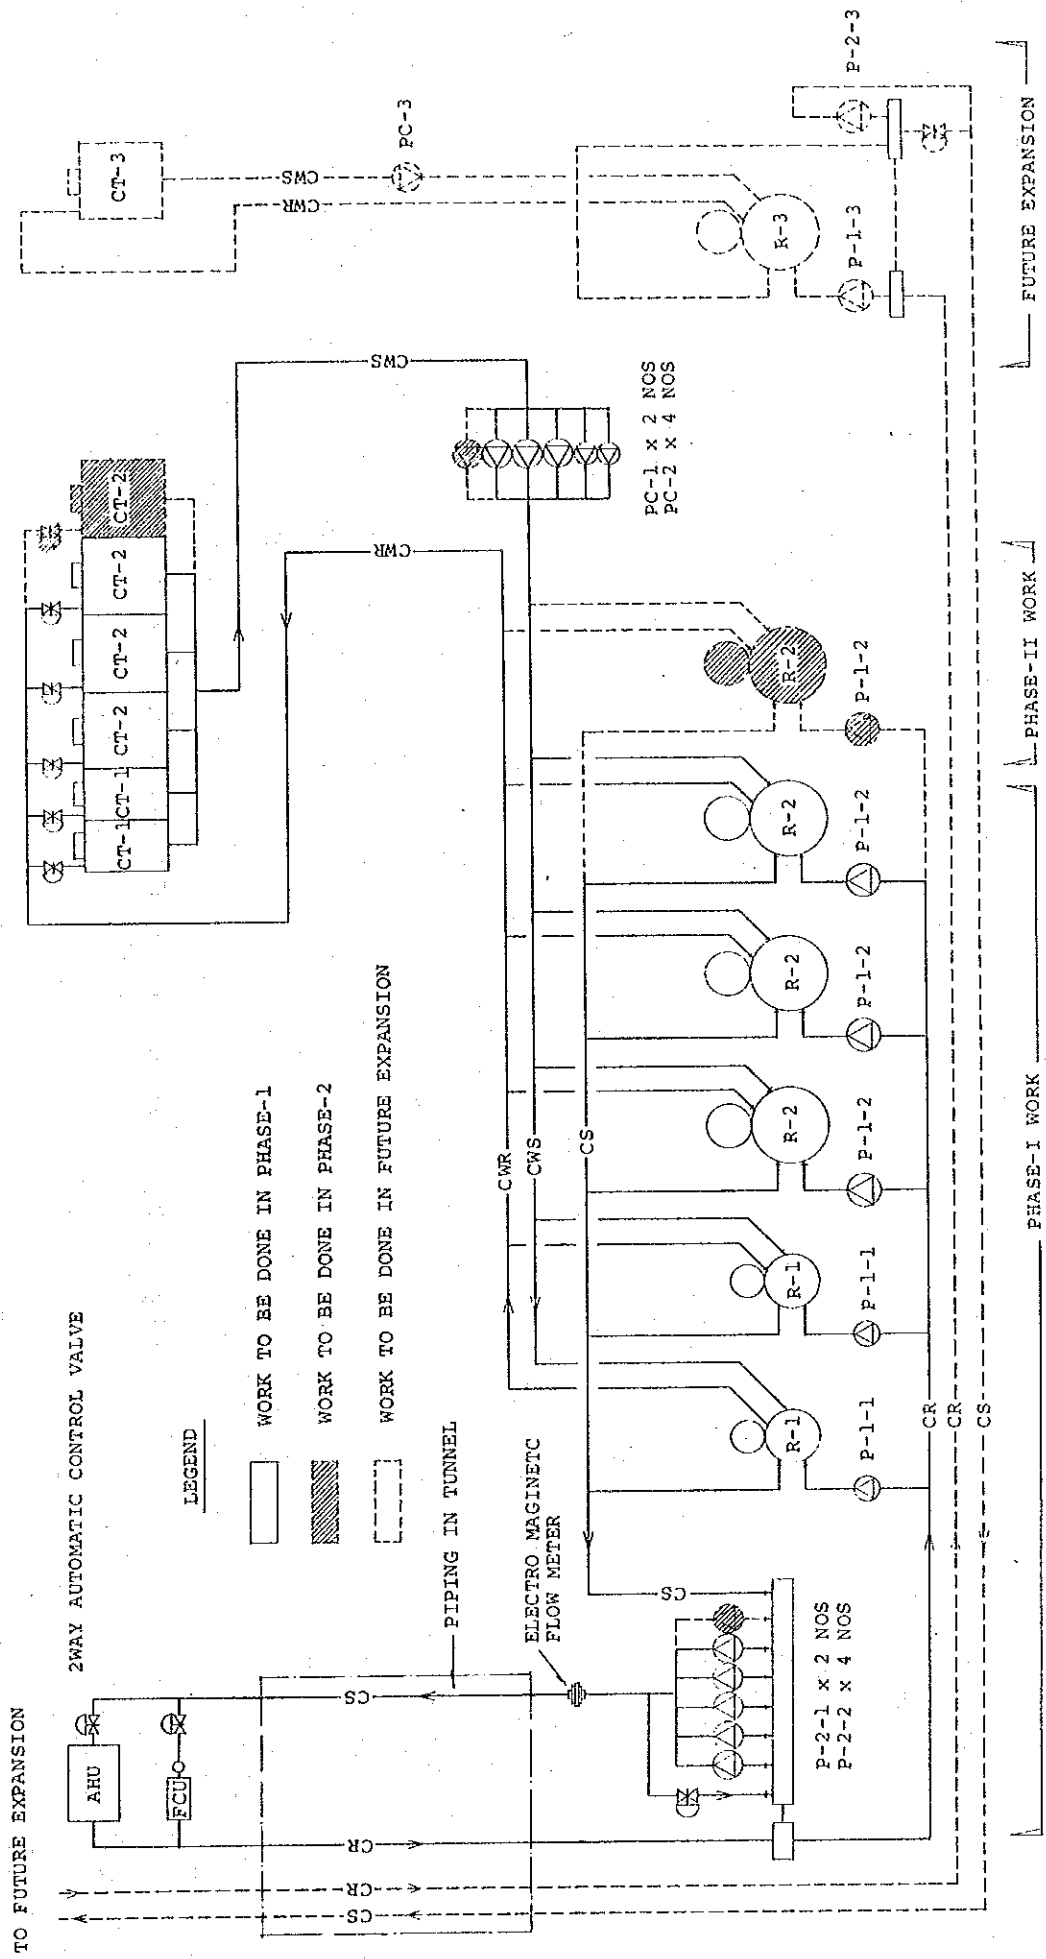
CHILLED WATER PIPING DIAGRAM
